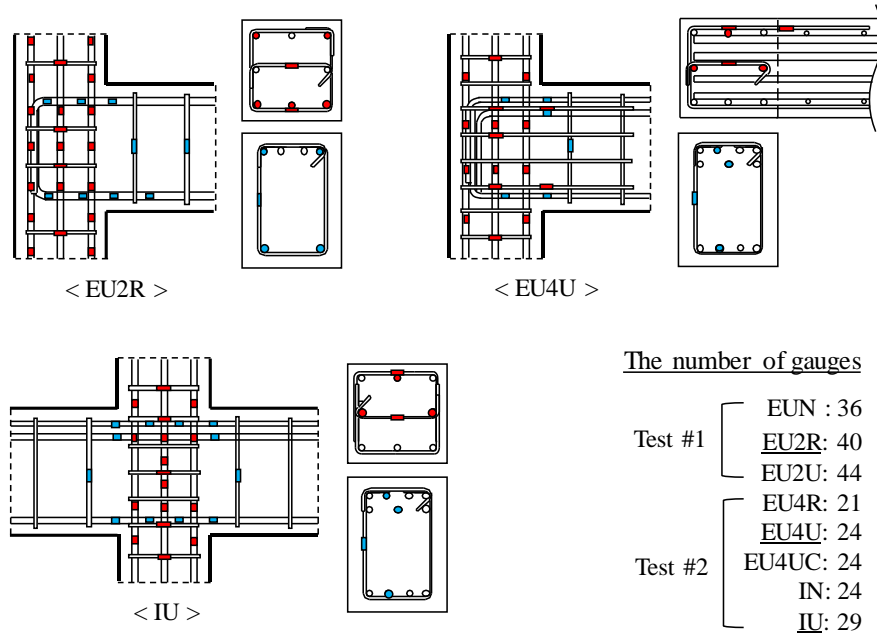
The locations of strain gauges in beam-column connection specimens
